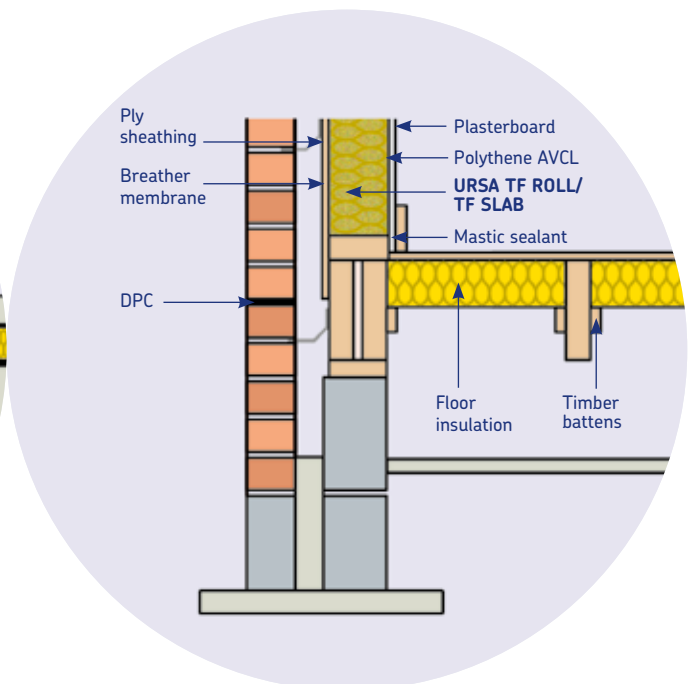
Wall/Floor Junction Insulation Above Slab (Timber Floor)
